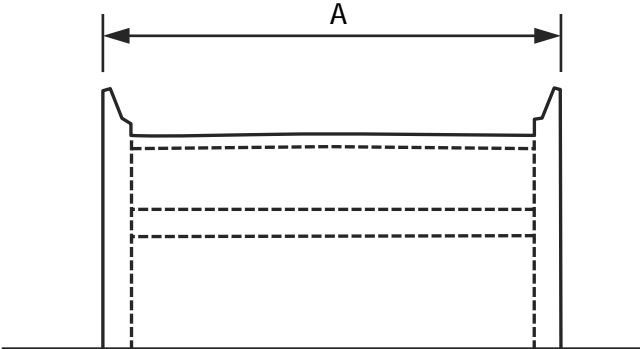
Cross-section view of a filled arch bridge or culvert under fill with headwalls.
